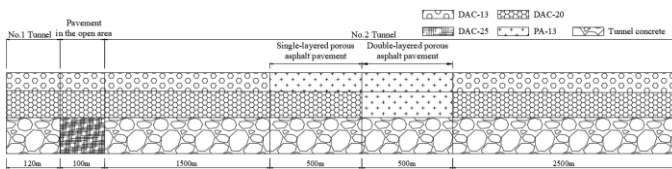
Schematic representation of the pavement structure in the two tunnels.
